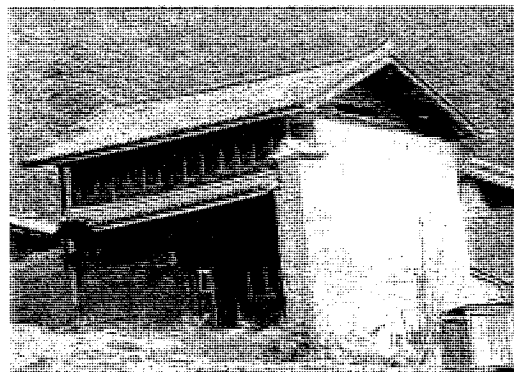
Villager's Timber frame adobe house, taken at Baowo Village, Songgui Town, Heqing County
